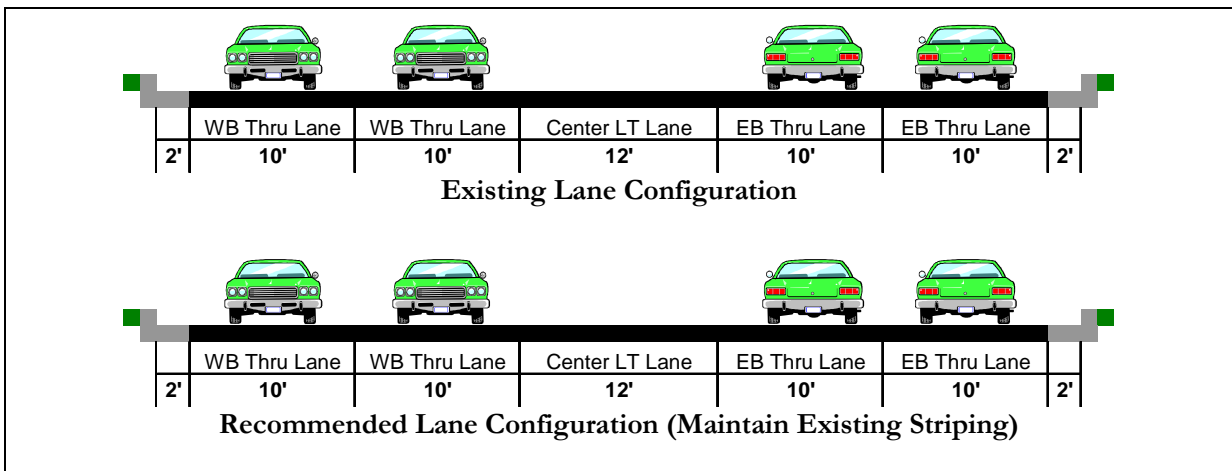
56-Foot Section (Between Fulton Street and Anderson Street)
